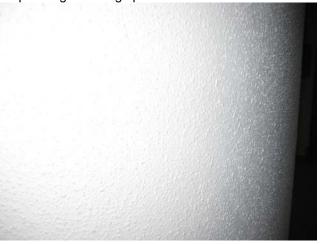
[Rm.5/7] Sprayed fibrous fireproofing in ceiling space (Sample set TH-5).
